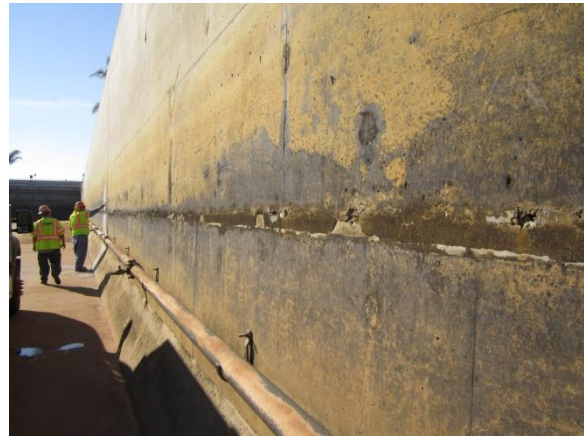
Reinforcing bar exposed at construction joint intermittently over approximate 50-foot length.
